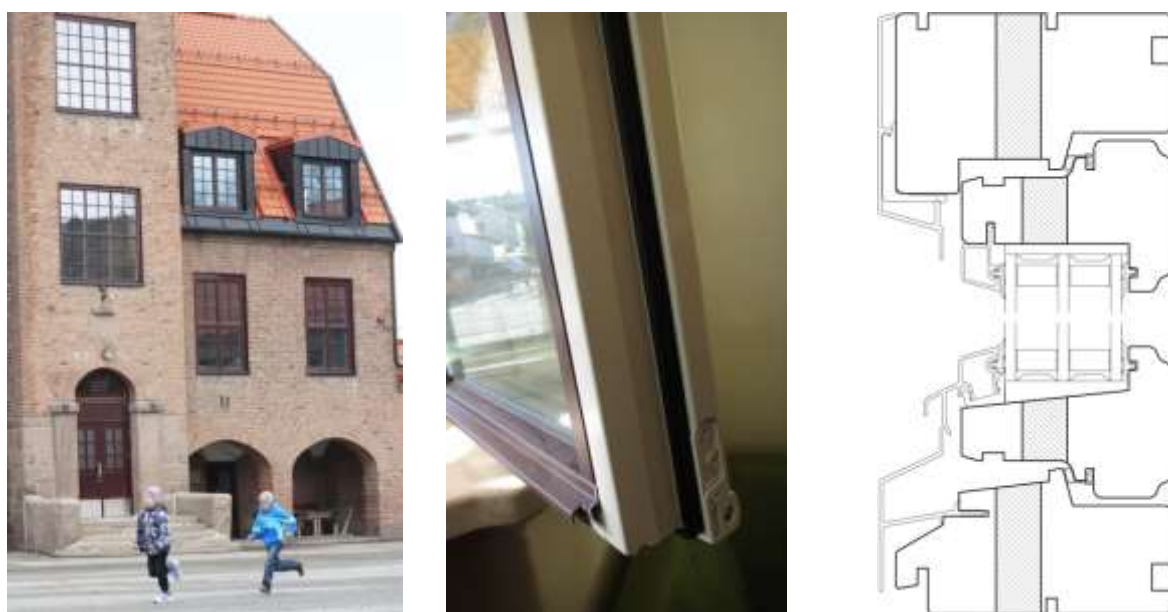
Left: Façade segment showing new passive house windows from NorDan. Middle: Close up photo of new window. Photos: S. Røgeberg. Mai 2012. Right: Vertical section. Note the insulated frames.
